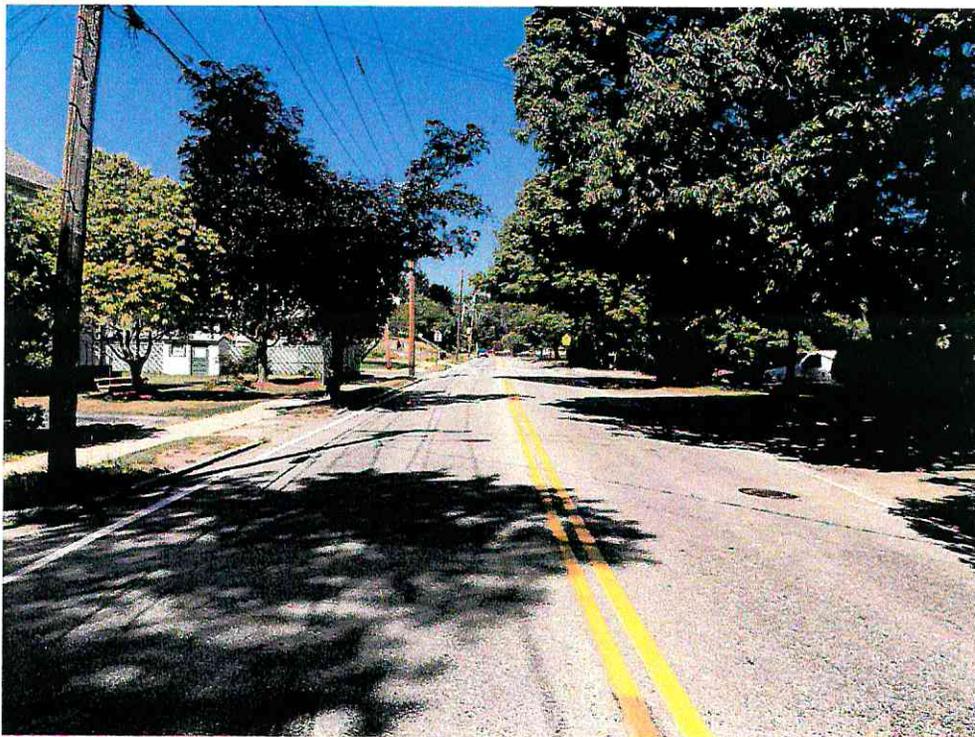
Location e – Cross St. looking west. 95' east of George St.
